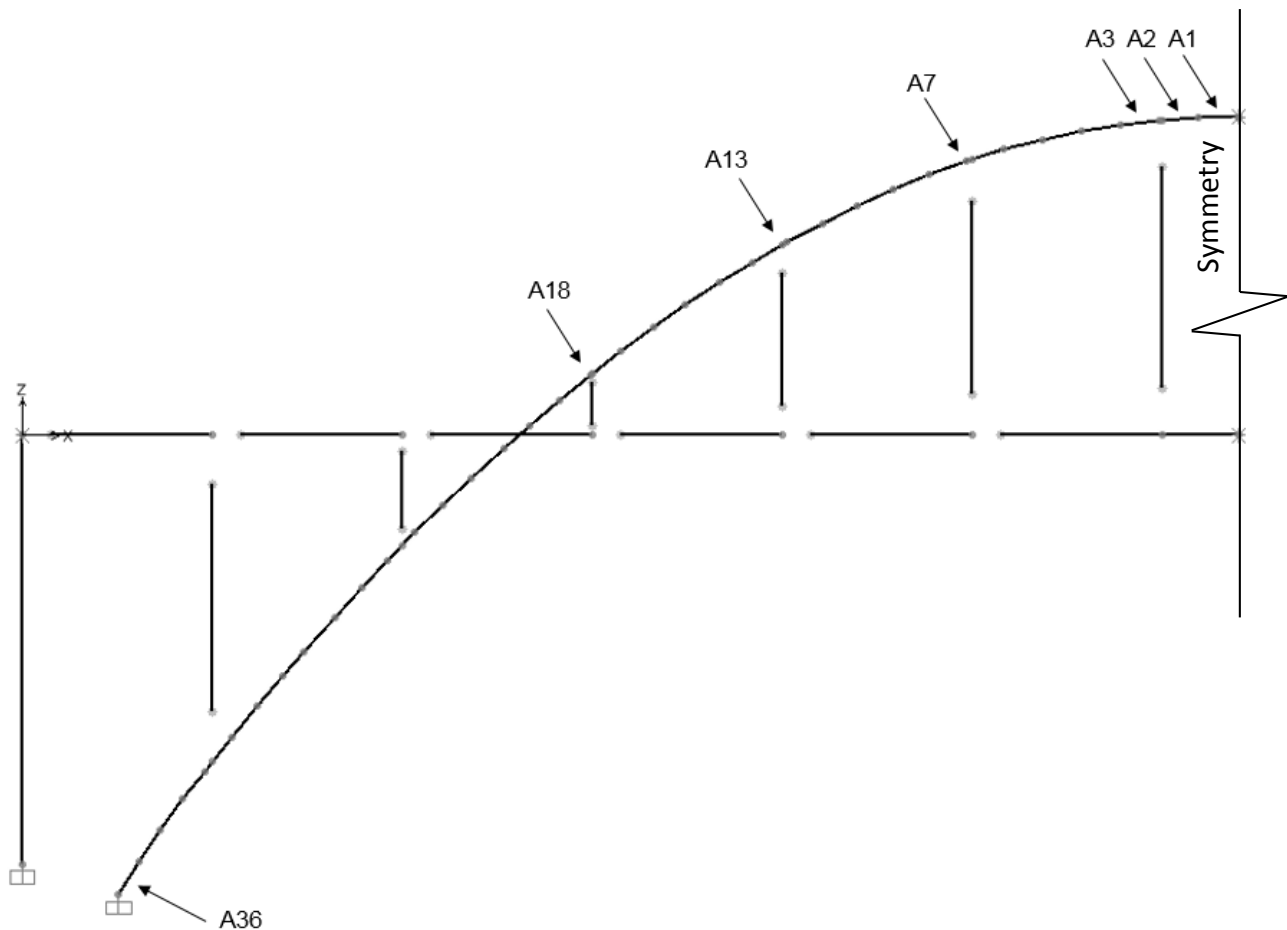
Span VI - Arch Rib with Rated Sections Labeled (SAP 2013)
